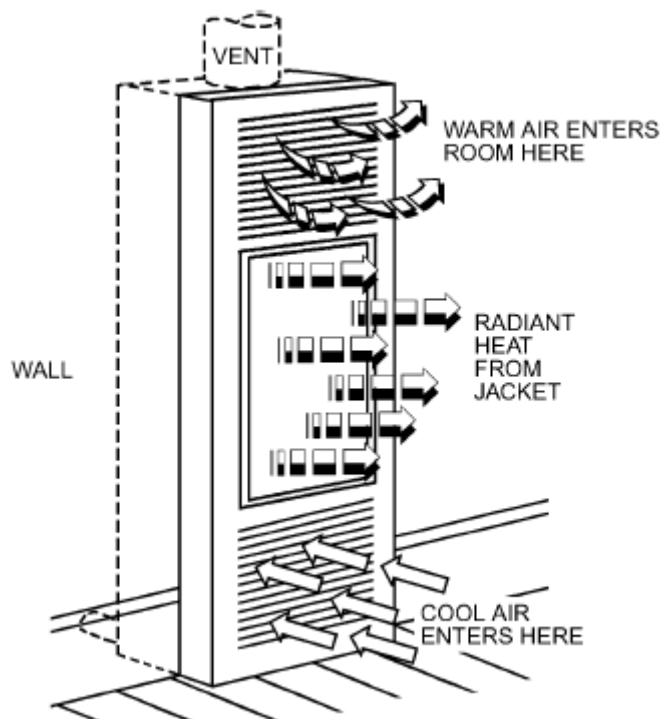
Wall Furnace (Source ASHRAE Handbook: HVAC System & Equipment)
